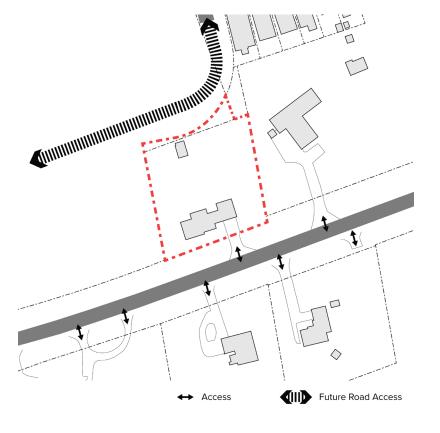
Draft Block Plan for 1938 and 1964 Commissioners Road E.
